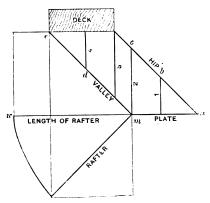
Method of Obtaining the Lengths from Plan Lines.
